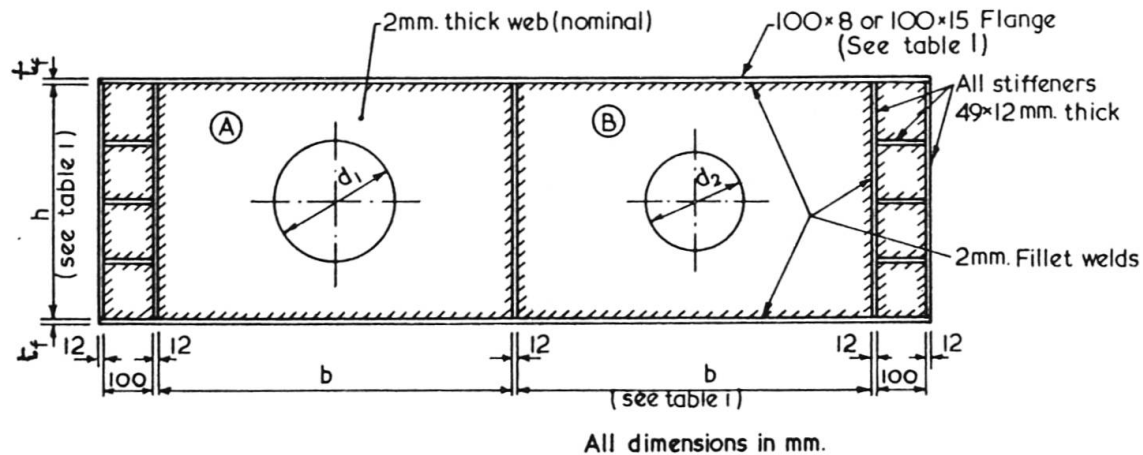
DETAILS OF THE EXPERIMENTAL GIRDERS:- (SERIES 1 & 2)
